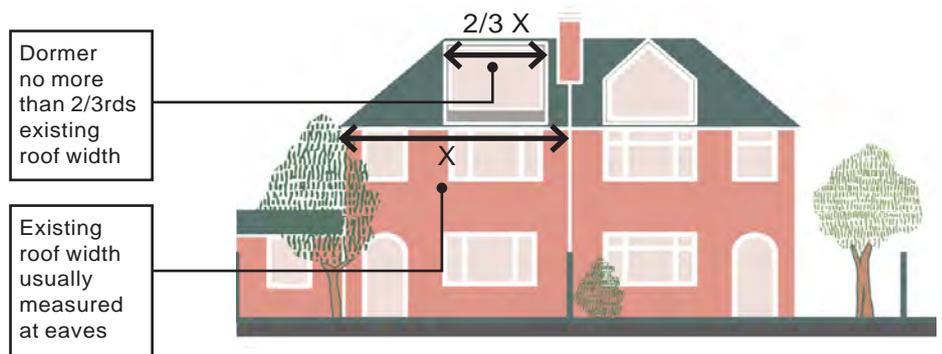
Dormers on a semi-detached or detached house, no more than two thirds the width of the existing roof, and set in from the edge of a hipped roof (or a gable end).
